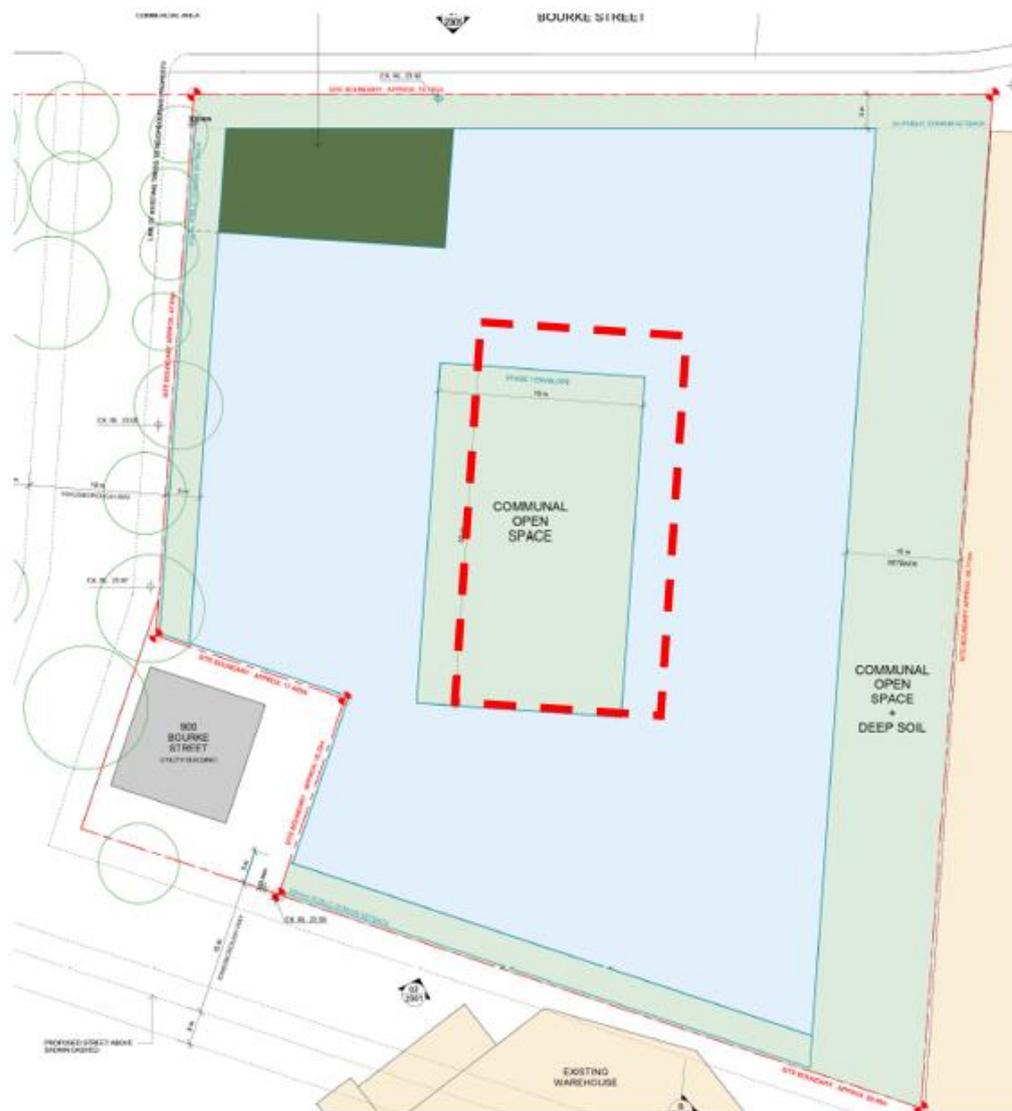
Amended ground floor envelope with location of original courtyard shown in red
